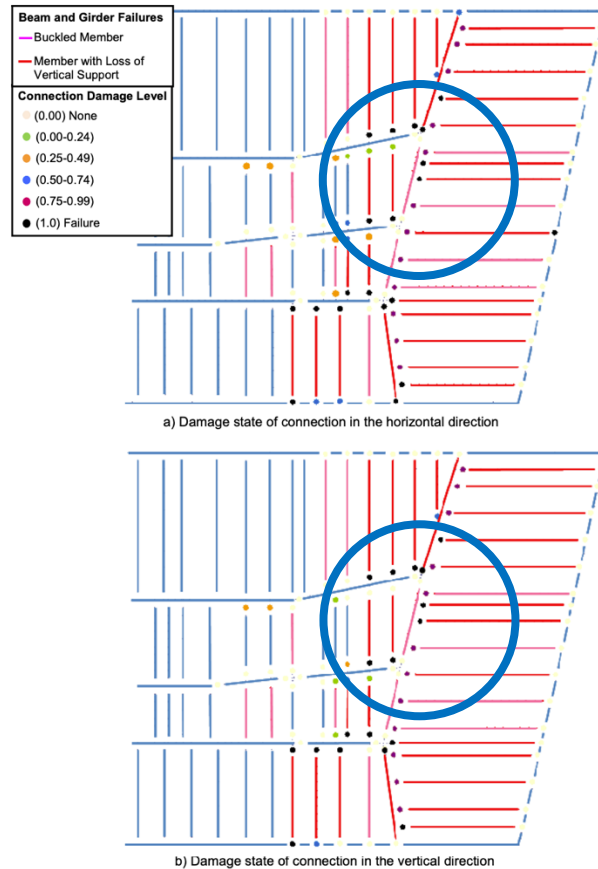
Damage state of connections, beams, and girders in Floor 13 at 4.0 h for Case B temperatures.
